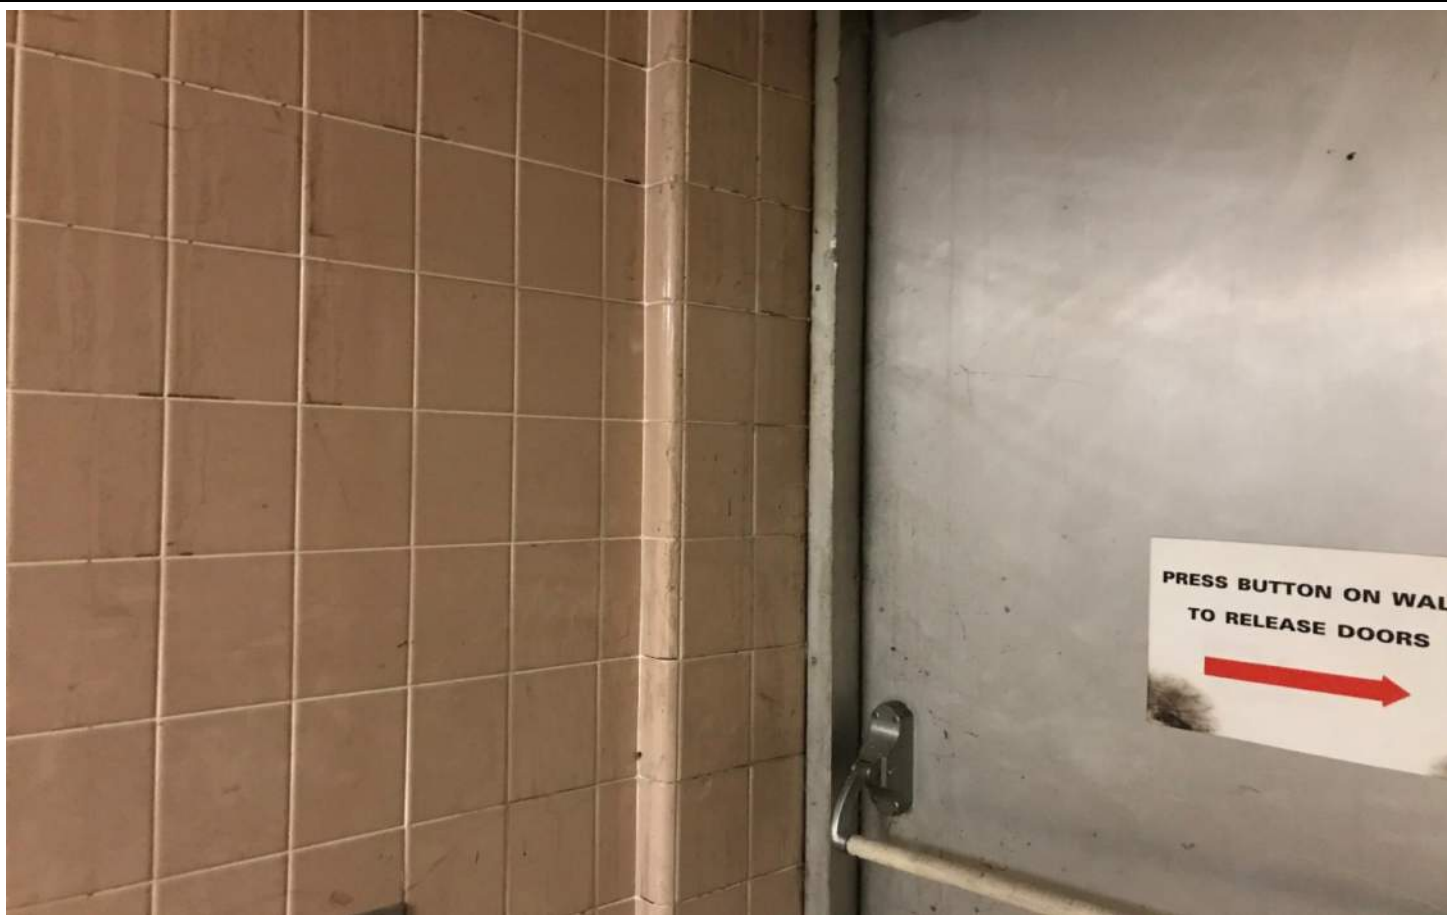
Photograph of the ceramic wall tile in West Penthouse stairwell. The grout and mudset were determine to be non-ACM.
